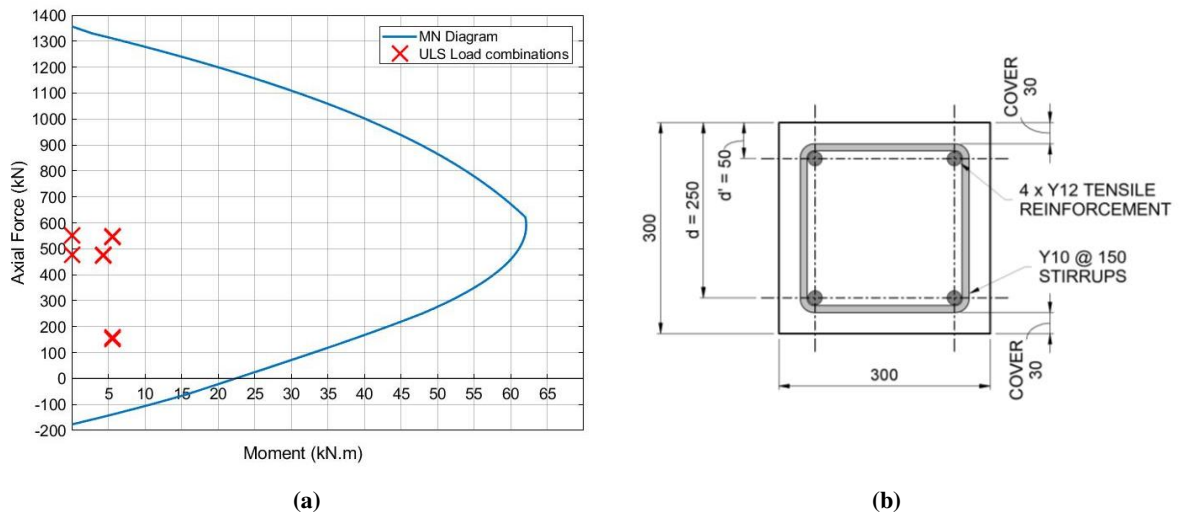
Design of the reinforced concrete column showing (a) the MN-Interaction diagram for the column of the footing at ULS and (b) a section through the reinforced concrete column of the footing
